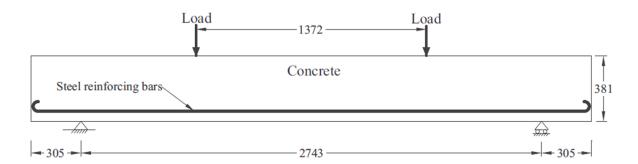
Beam test setup (from Ma and Kwan (2015)) (all dimensions in mm)
